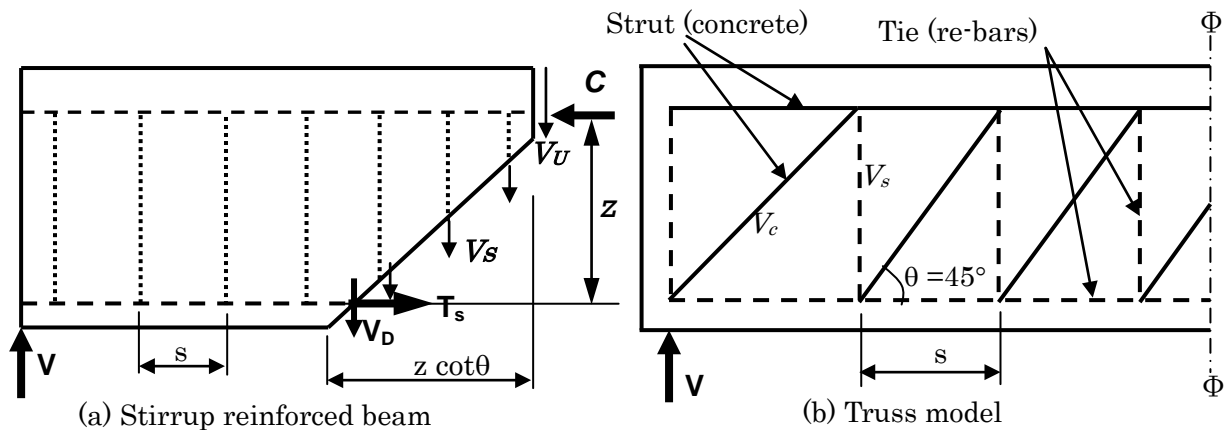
Shear resistive mechanism in stirrup RC beam and the truss model
